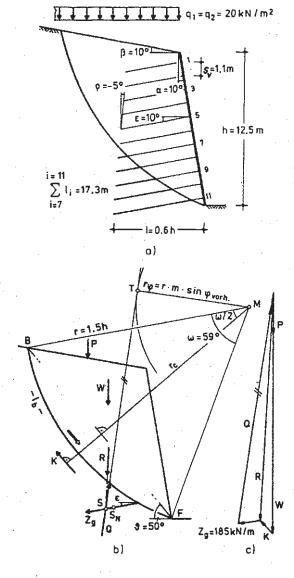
Stability calculation of a nailed wall: a) cross section with slip circle, b) free body diagram, c) force polygon
